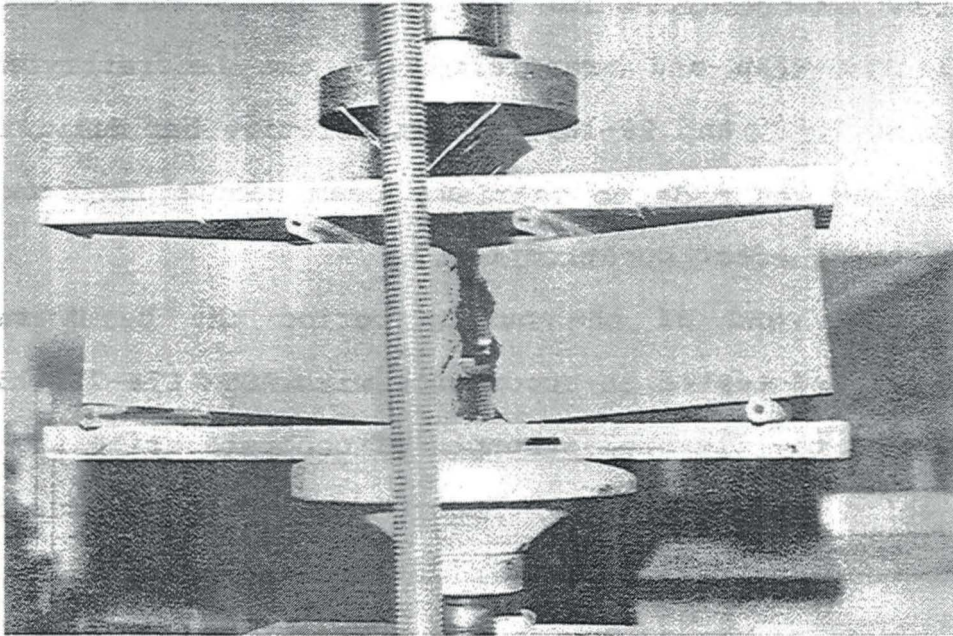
Load arrangement and mode of failure of stabilized beams
